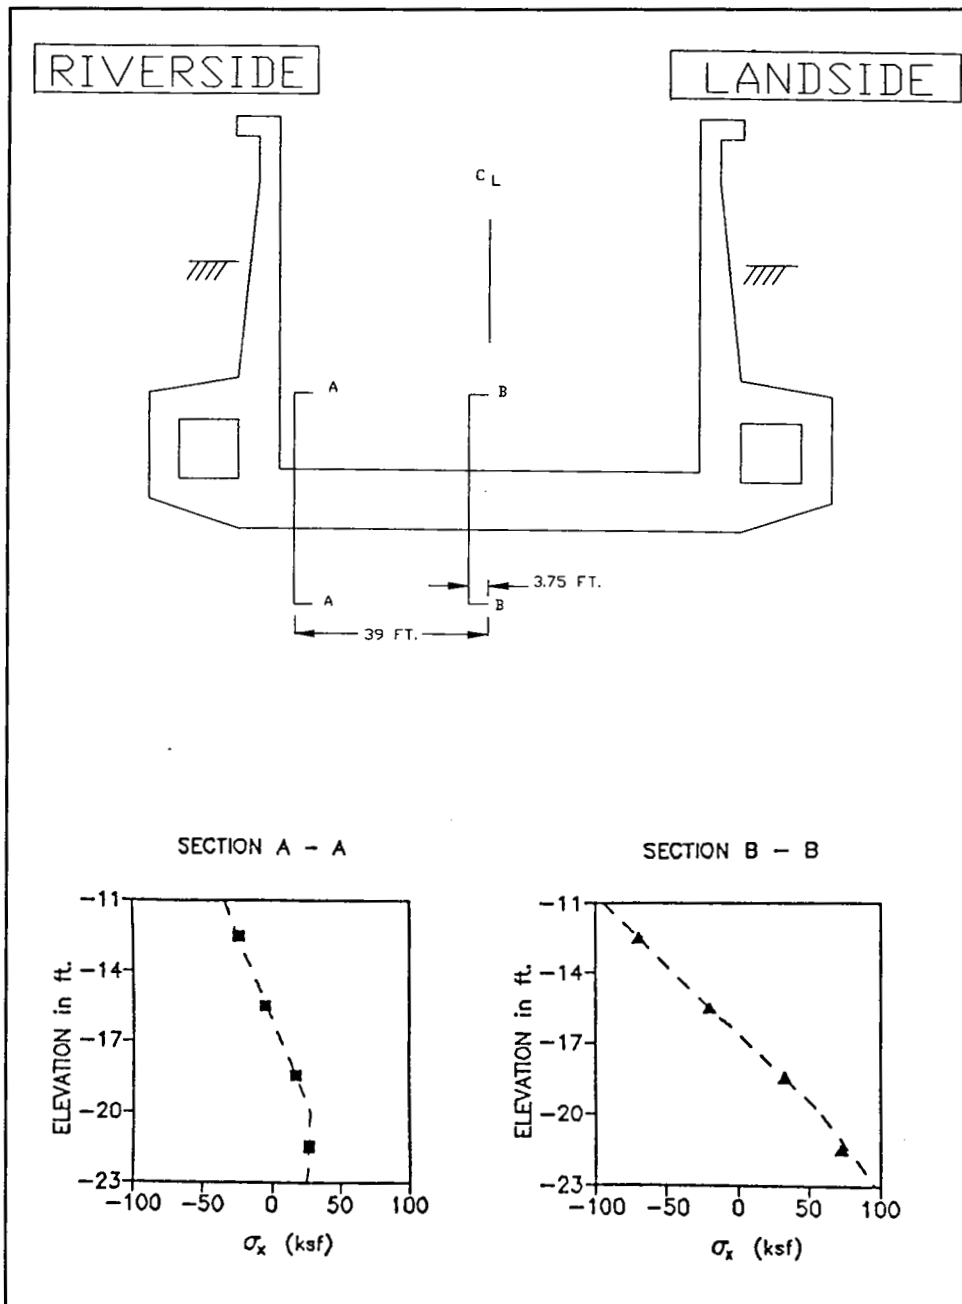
Stress distributions across two sections within lock after lock construction and placement of backfill
